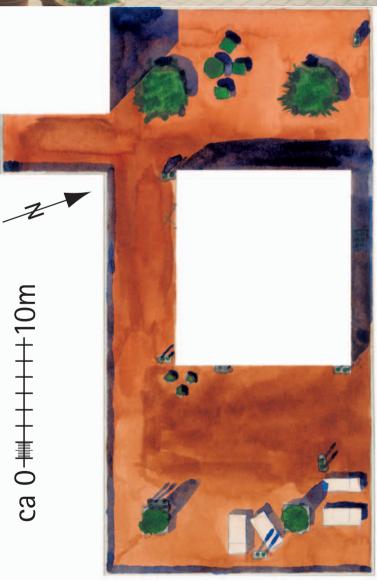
Watercolor plan of the shared rooftop on 47 west 24th street
